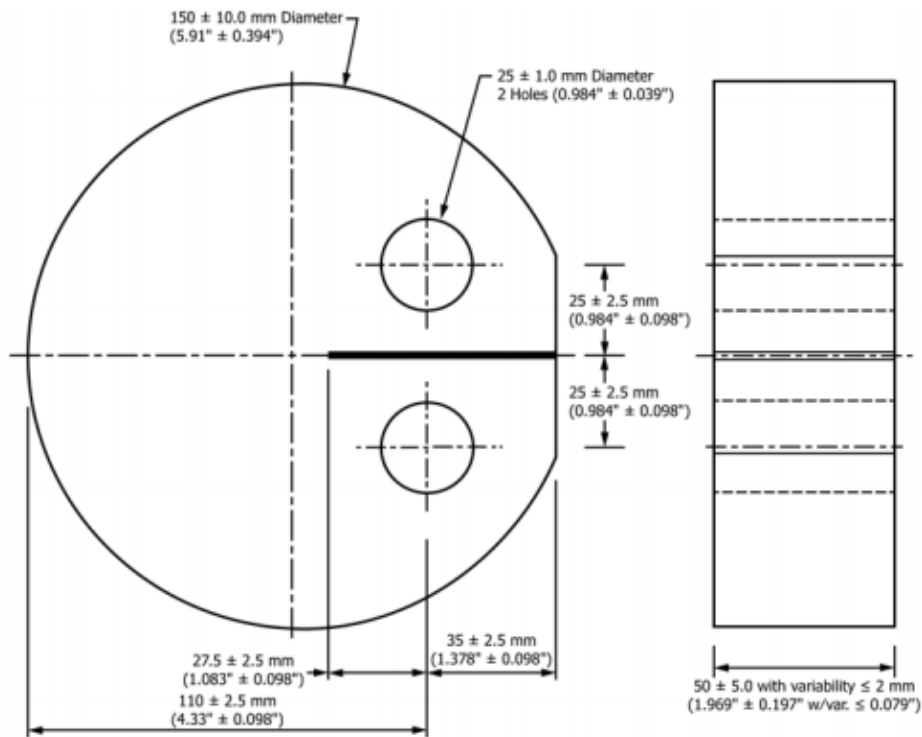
DC(T) specimen dimensions (ASTM D7313-13)
